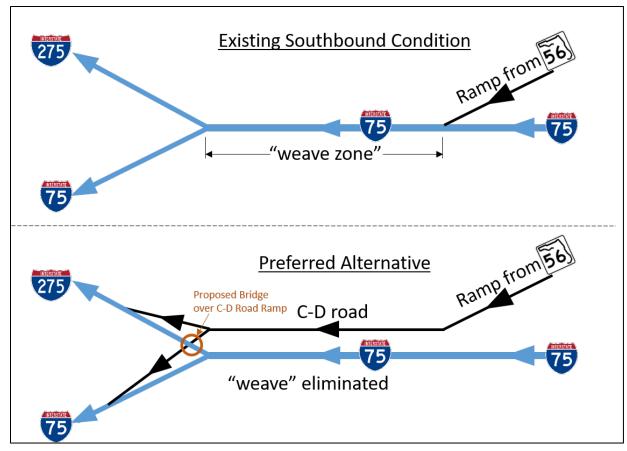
Existing and Proposed Traffic Routing for I-75, I-275 & SR 56 Ramp
